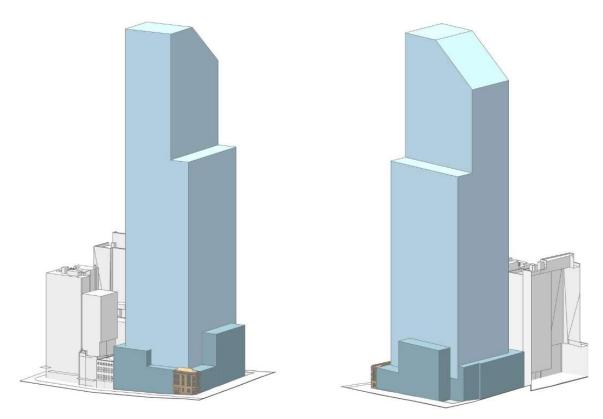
3D view of the proposed planning envelope Hunter Street West site provided by FJMT
